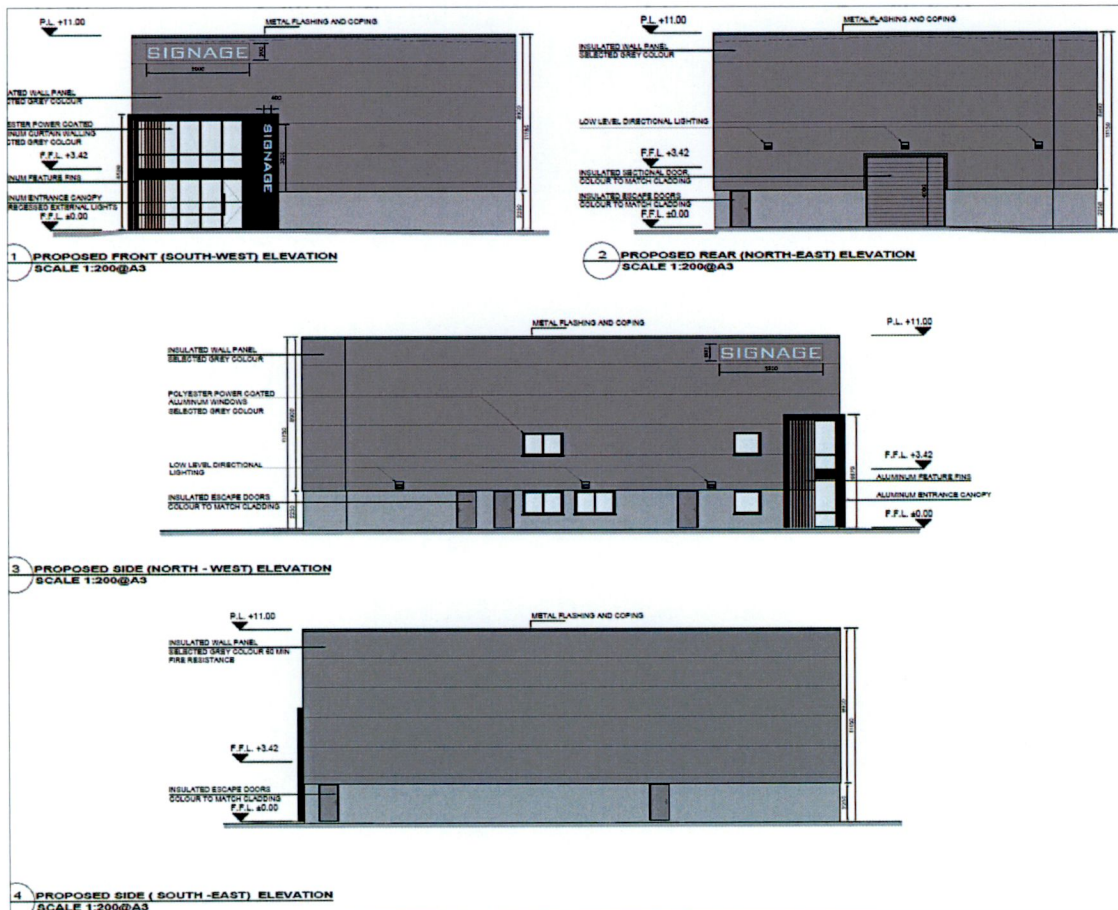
Proposed Elevations (Drawing No.: B0125-A-012)
